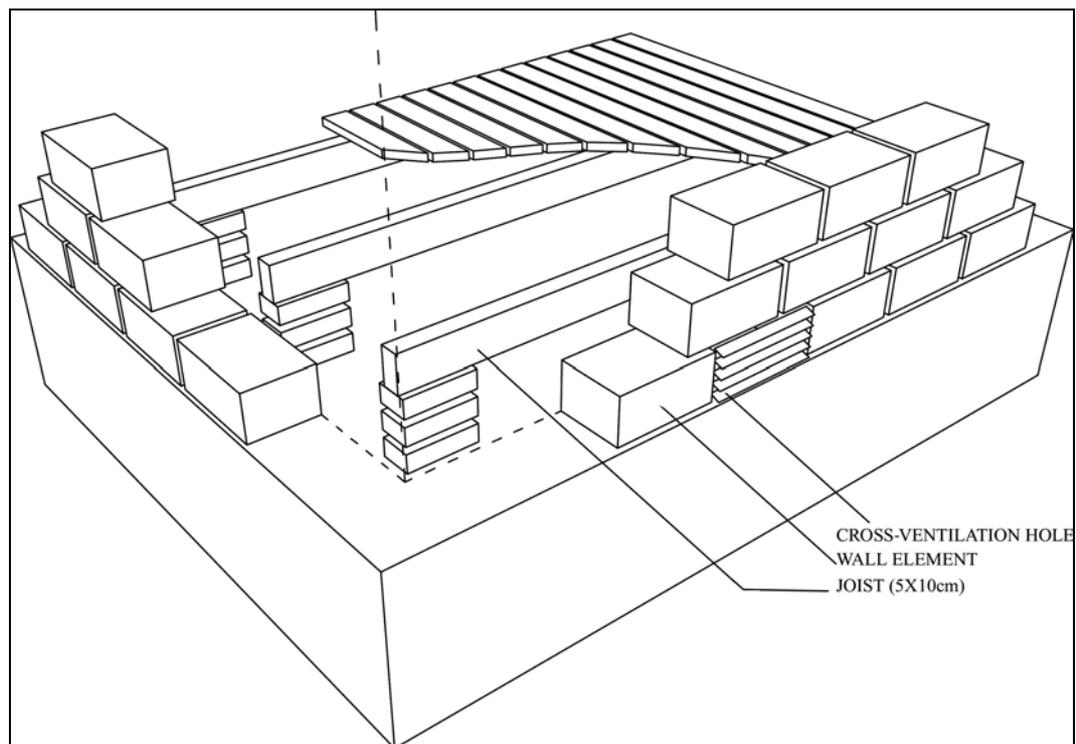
Utilization of natural ventilation at suspended ground floor of the sample dwelling for eliminating humidity in summer
